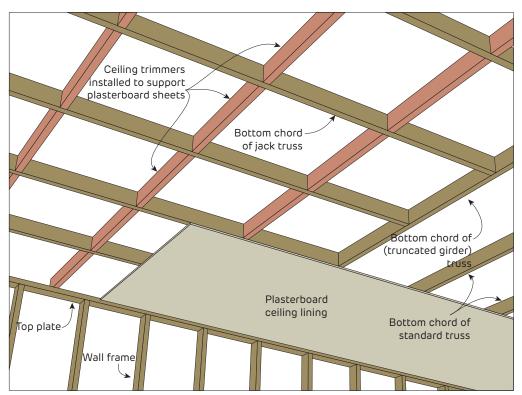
Trimmers to Support Ceiling Lining at Change of Truss DirectionPerspective
